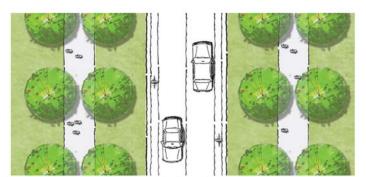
A Plan of typical two-lane Campus Greenbelt at Northwest of FIU Arena
